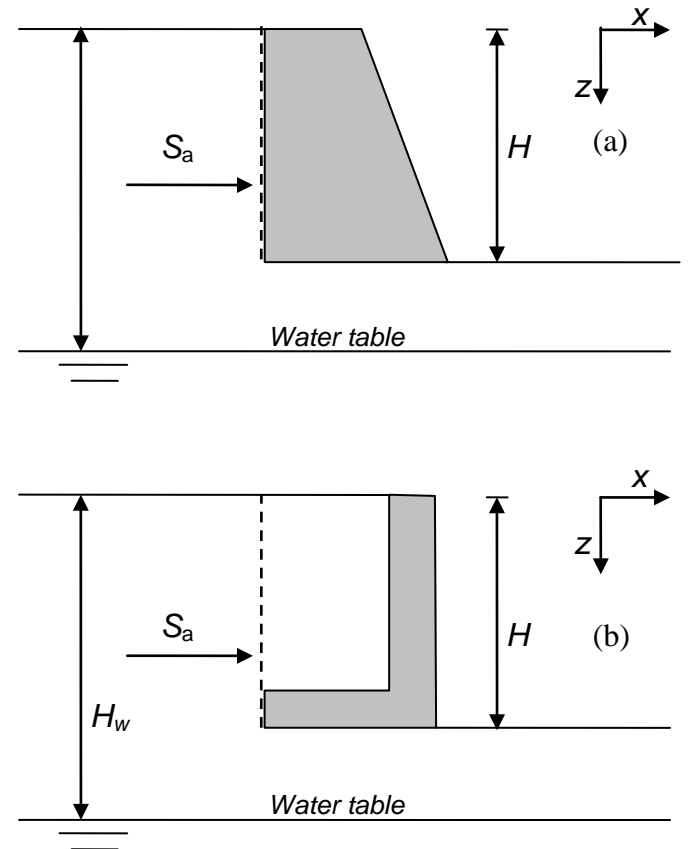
Main types of retaining walls, gravity (a) and cantilever (b).
